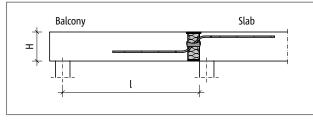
Schöck Isokorb® T type Q-E-V: Static system
